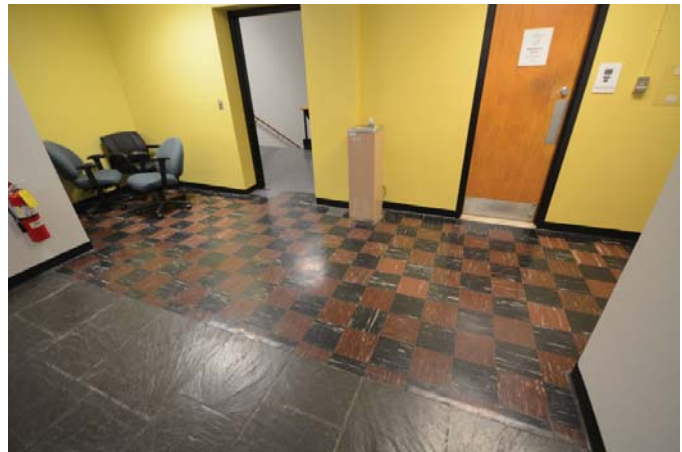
A portion of the original flooring at the second floor landing between Old Rich (left) and the Calculator Building (right).
